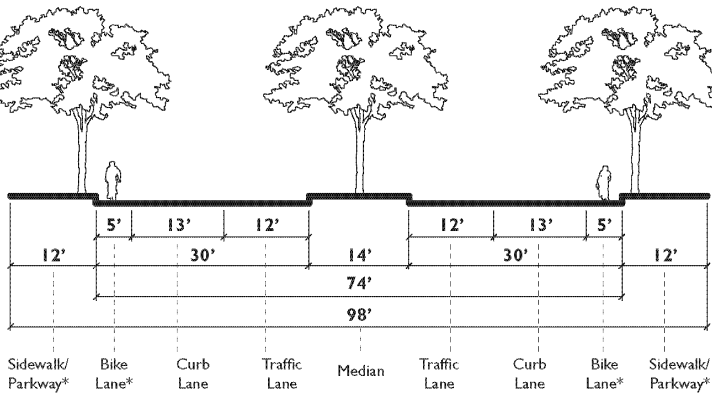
(2 of 2): CITY OF CHINO GENERAL PLAN ROADWAY CROSS-SECTIONS
